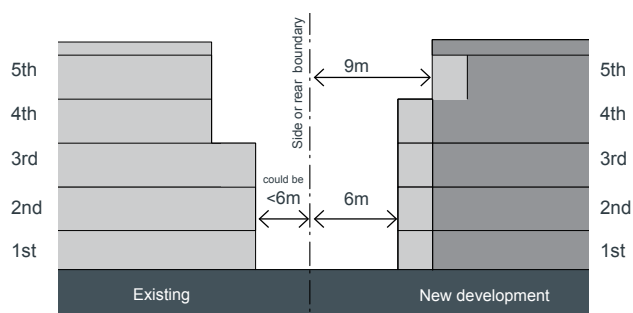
F.3 New development adjacent to existing buildings should have unimpeded space in front of habitable rooms and balconies (6-12m depending on building height)
